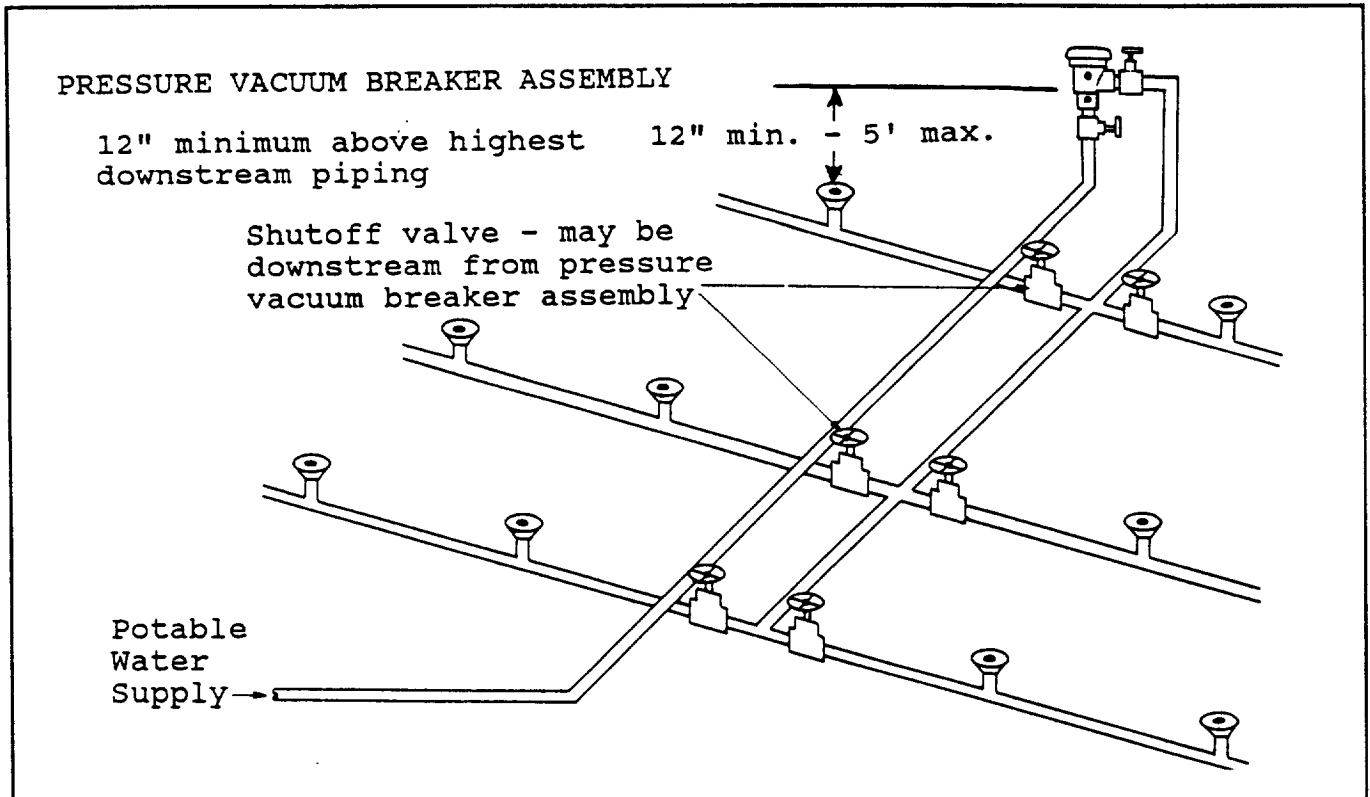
Hillside Irrigation System Using Pressure Vacuum Breaker Assembly.
